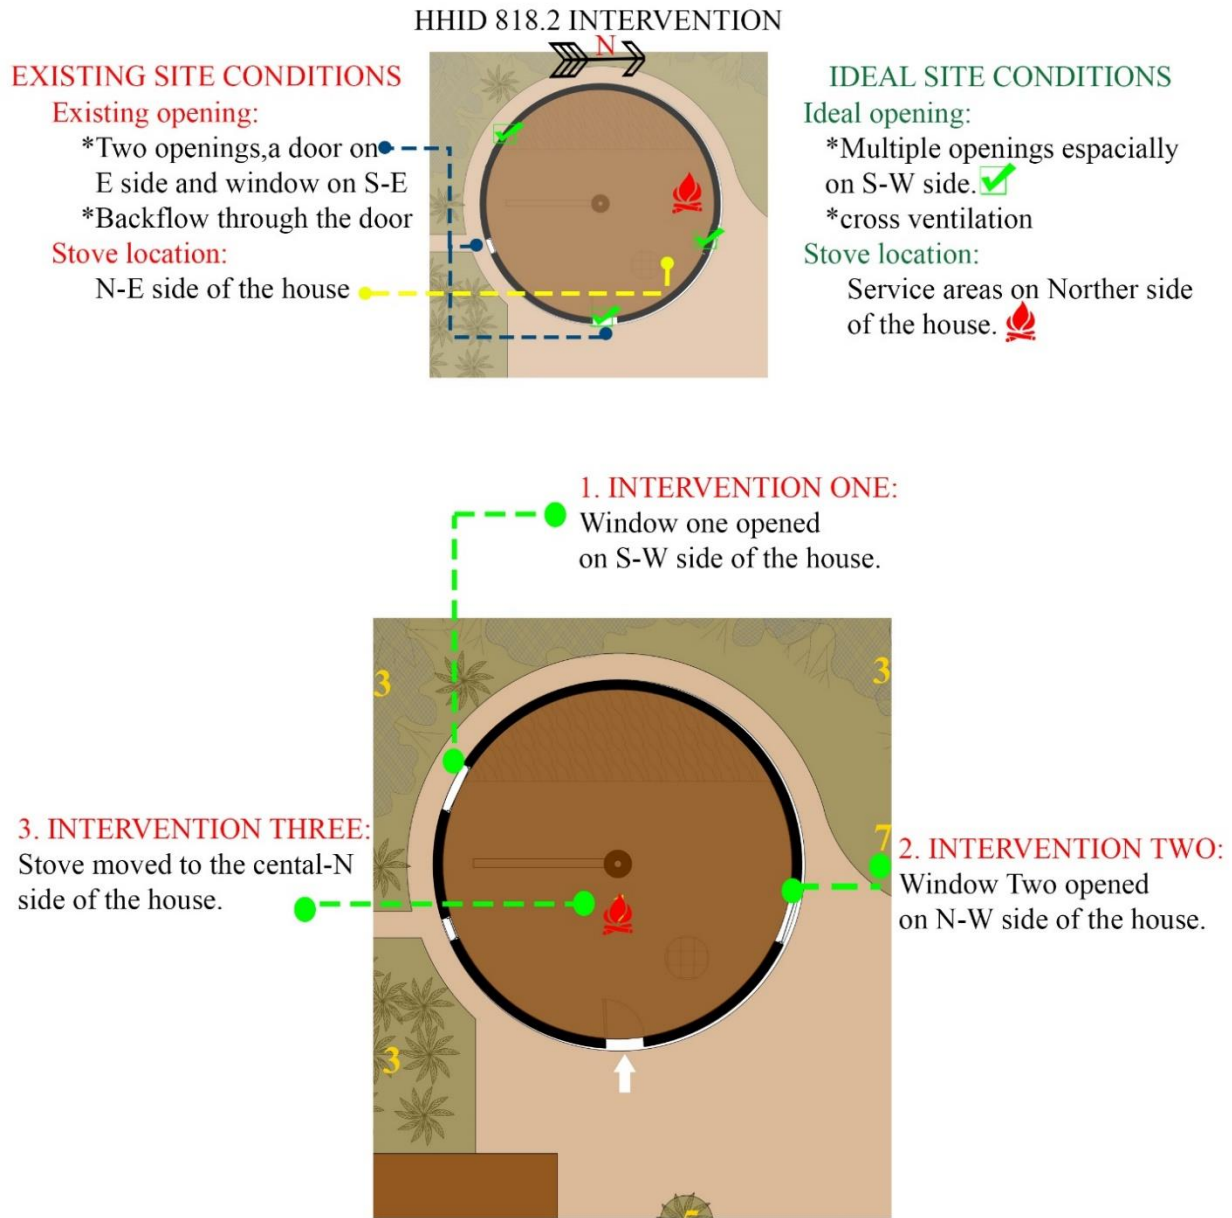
Experimental House No.3 Site plan, Floor plan and section view with pre and post intervention diagrams
